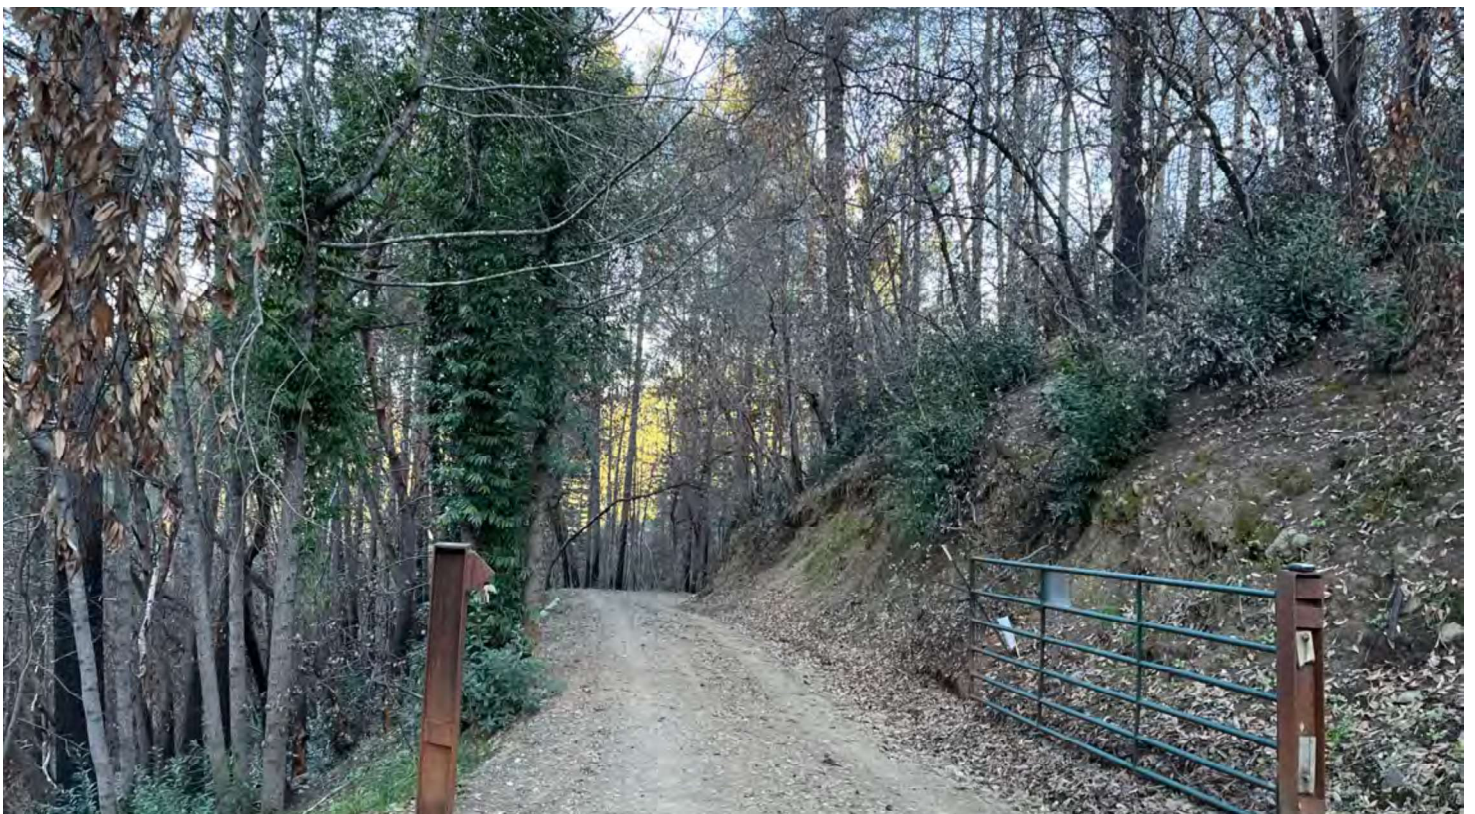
Project Parcels Driveway looking North toward Sweetwater Springs Road
